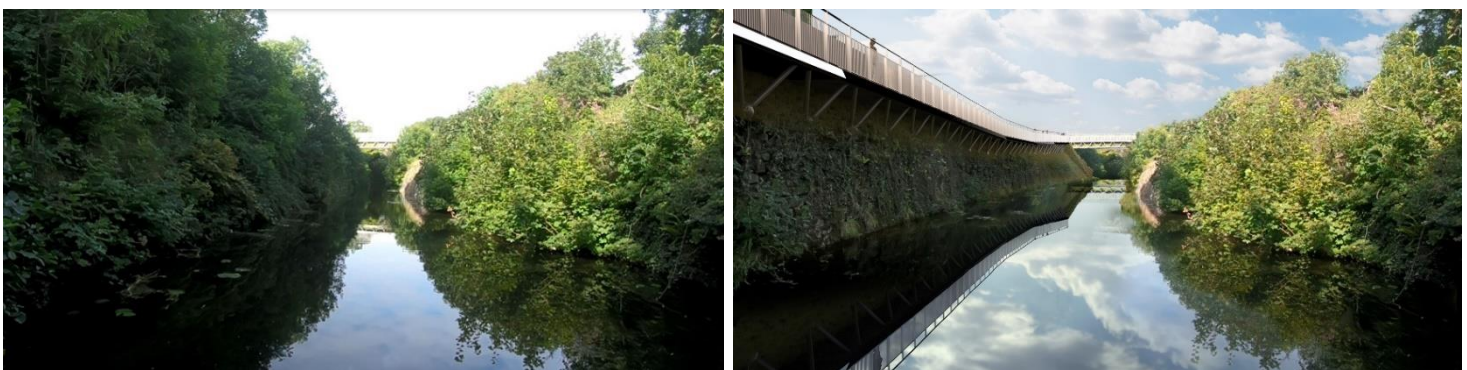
Photograph of existing southern embankment (left) Vs Photomontage of cantilevered boardwalk (right), facing west towards Kirkpatrick Bridge
